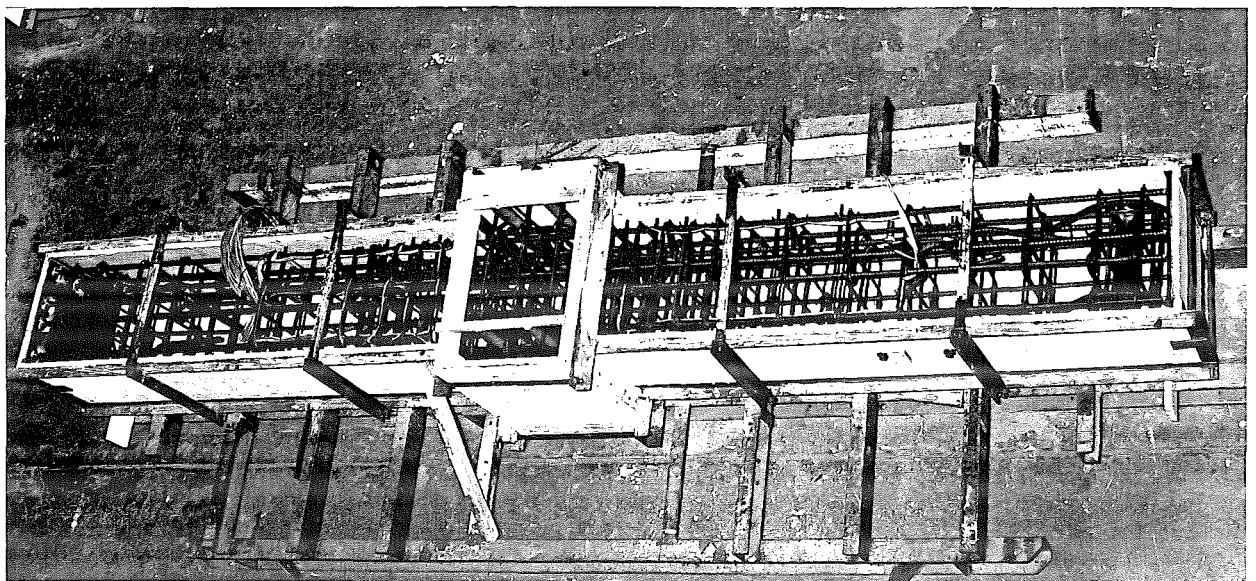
b STEEL CAGE IN MOULD (SQUARE)
